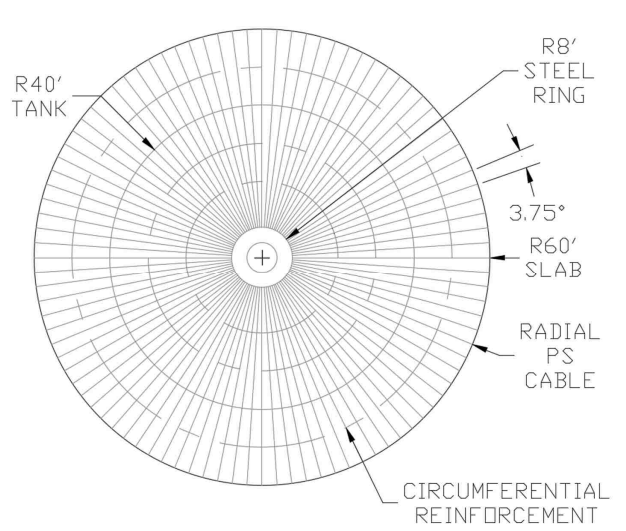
Posttensioning Cable and Circumferential Reinforcement Layout for Concrete Slab Including Inner Steel Ring
